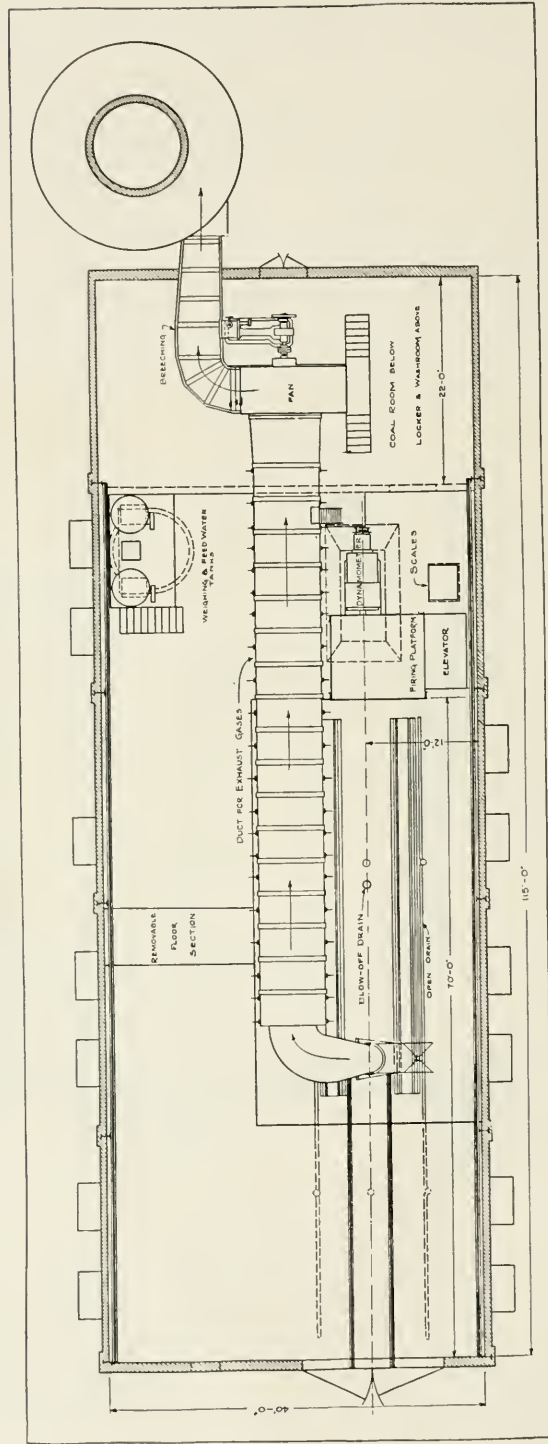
A Longitudinal Section Through the Laboratory, Showing the General Features of the Building Design and the Positions and Relations of the Apparatus.
